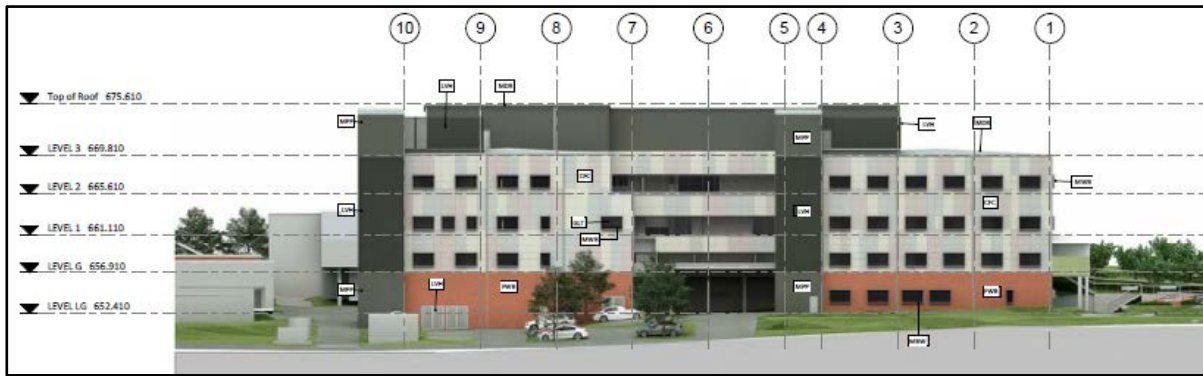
| Approved East elevation (Source: Modification 2 Application)
